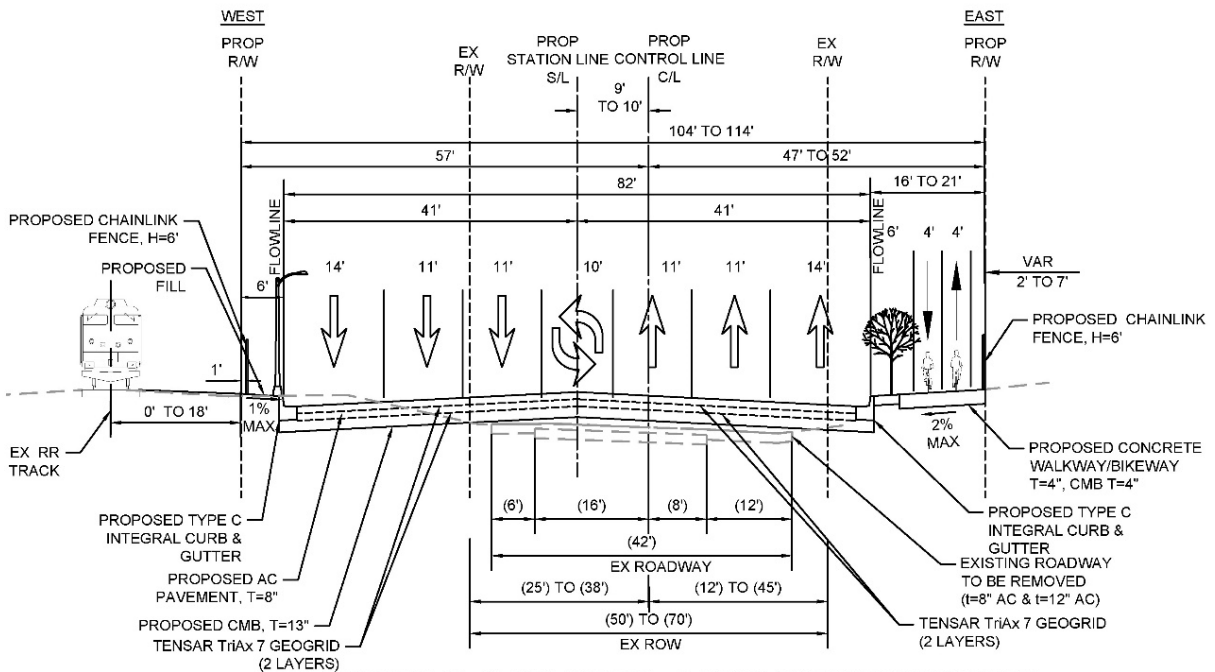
Proposed Cross Section of Alameda Street South of Henry Ford Avenue to Approximately 300 feet North of Anaheim Street (Looking North)
